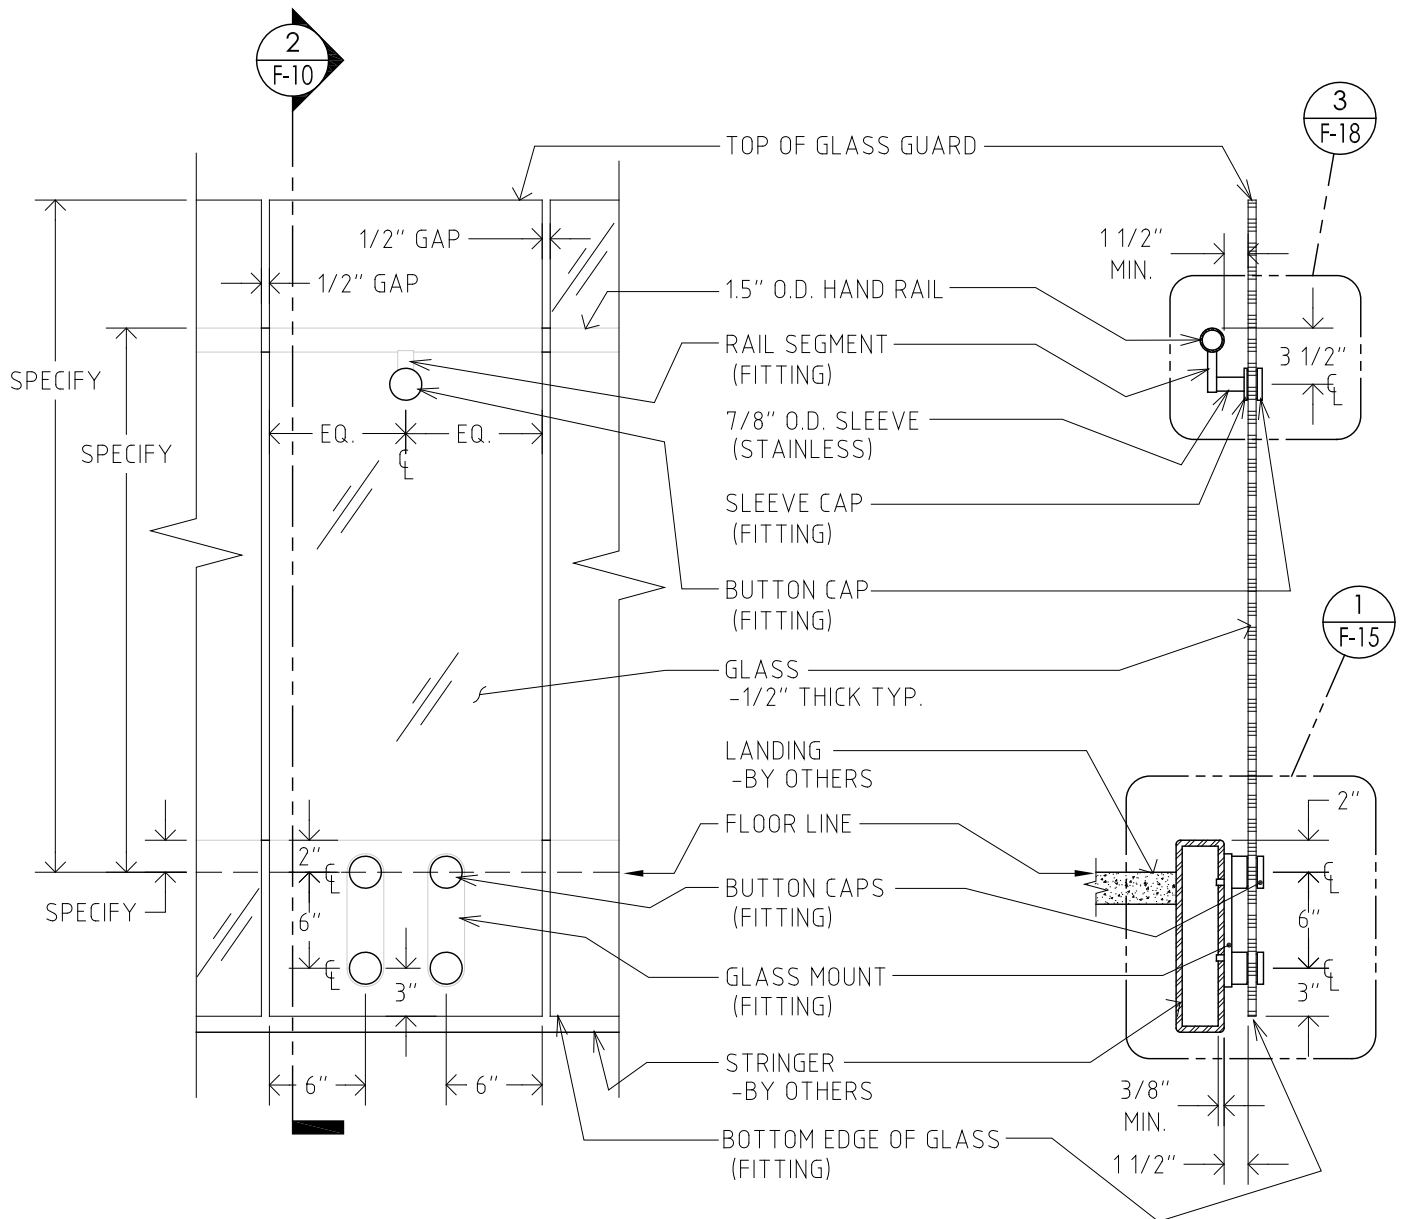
DETAIL ELEVATION: TOP MOUNT ON STAIR RUN
